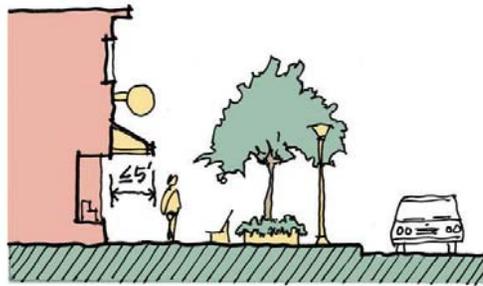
Exterior weather protection generally should not overhang for more than 5 feet from the building.
